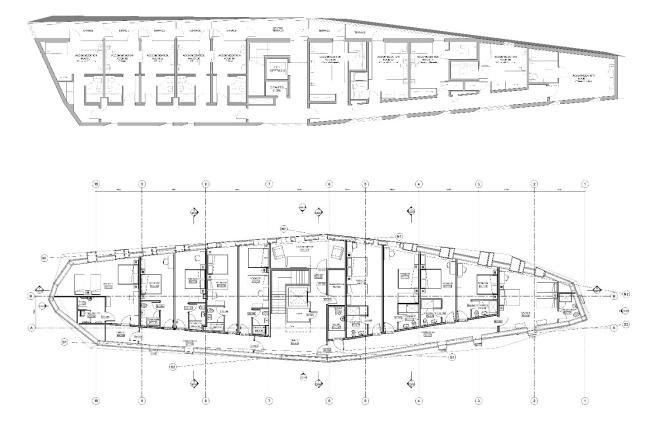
The approved Second Floor layout (top) and the revised Second Floor layout (bottom) showing the incorporation of the semi-external corridor into the footprint of the building.
